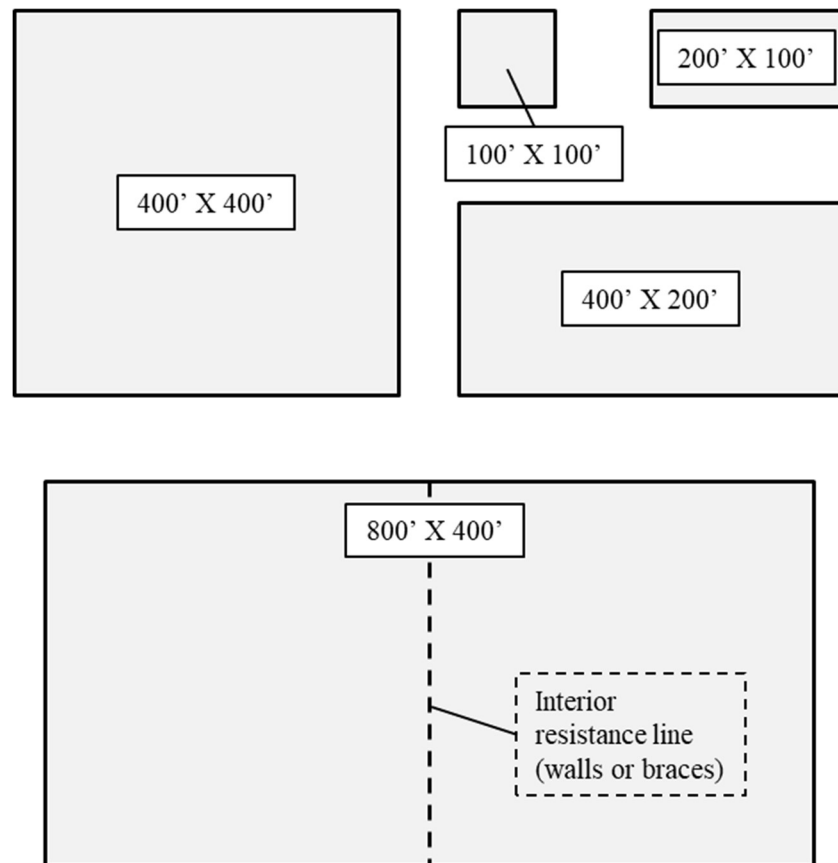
Plan configurations considered for special reinforced masonry rigid wall flexible diaphragm archetypes
